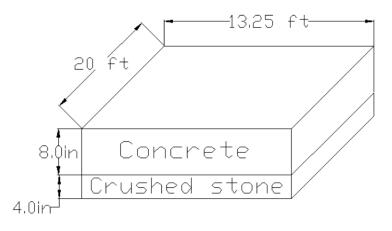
Typical slab structure of Highway 41 in Austria.
